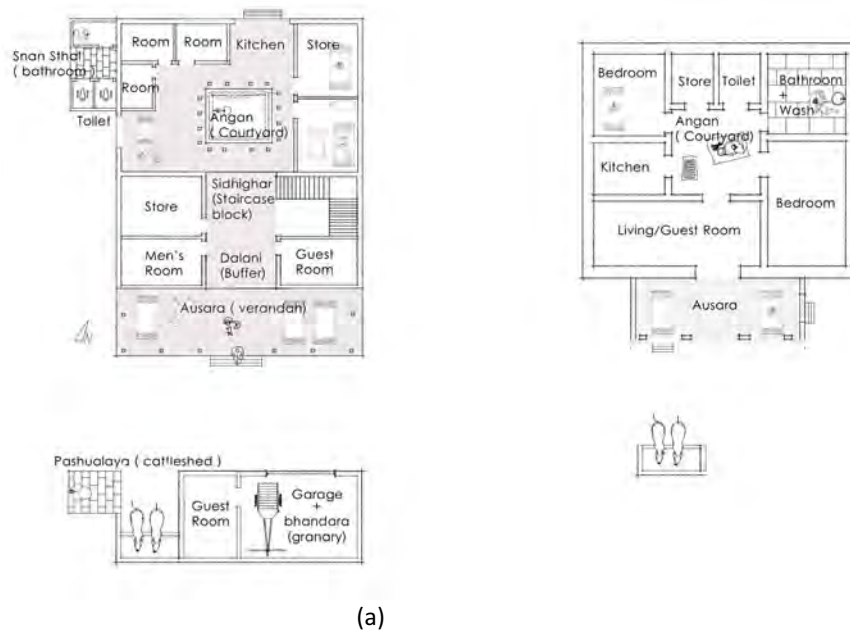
Plan of selected samples (a) Masonry house, Campiarganj ;(b) Mud house in Varanasi
